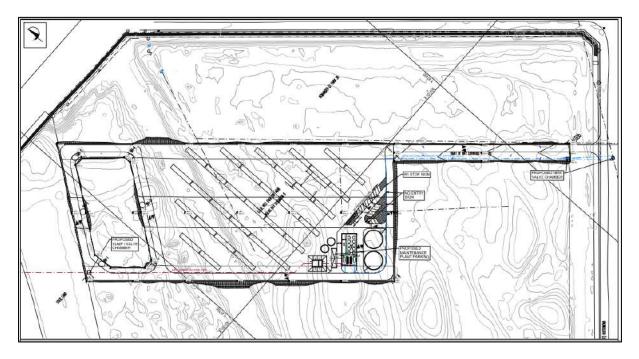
Proposed detailed layout of Desalination Plant in Walvis Bay (Image derived from Turnkey Solutions)
